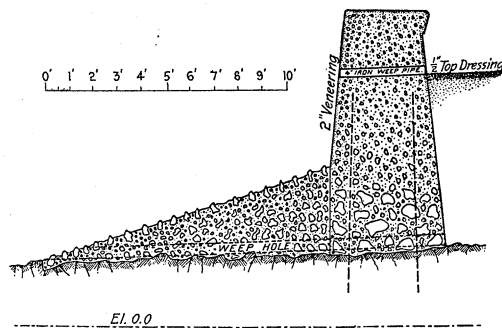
Section Showing Sea-Wall Building at Havana, Cuba.
